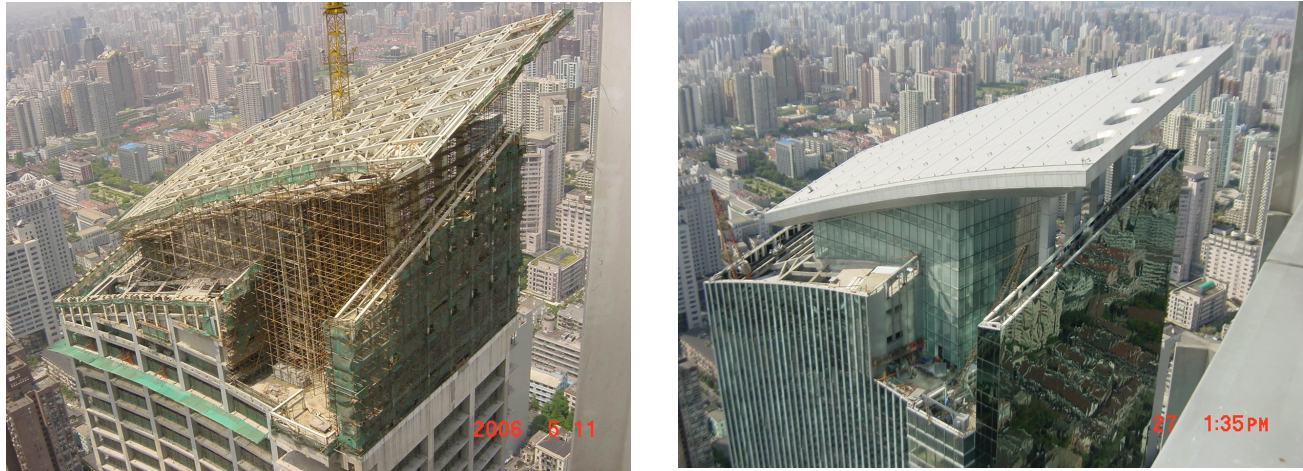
ROOF TRUSS CONSTRUCTION PHOTO
